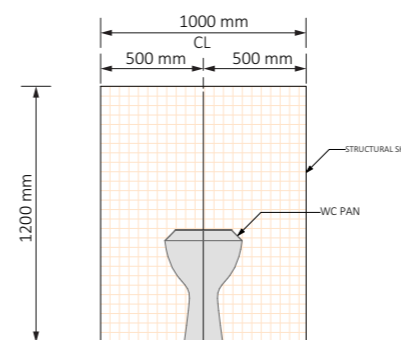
Location of sheeting for a wall behind a toilet pan
